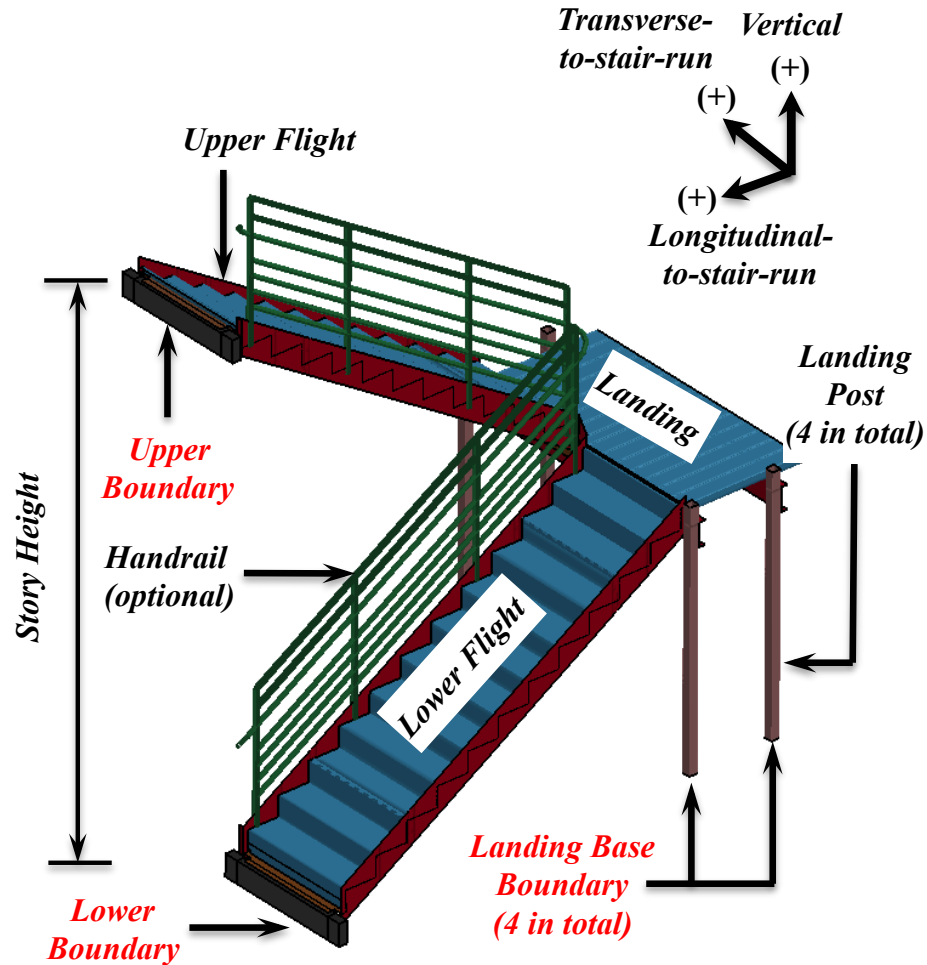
Finite element model of a generic prefabricated steel stair.
